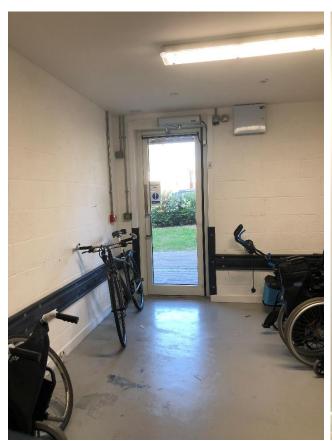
Building 1 images showing charging sockets, low level buffer rail, taped out bays to prevent bad parking & double access doors
